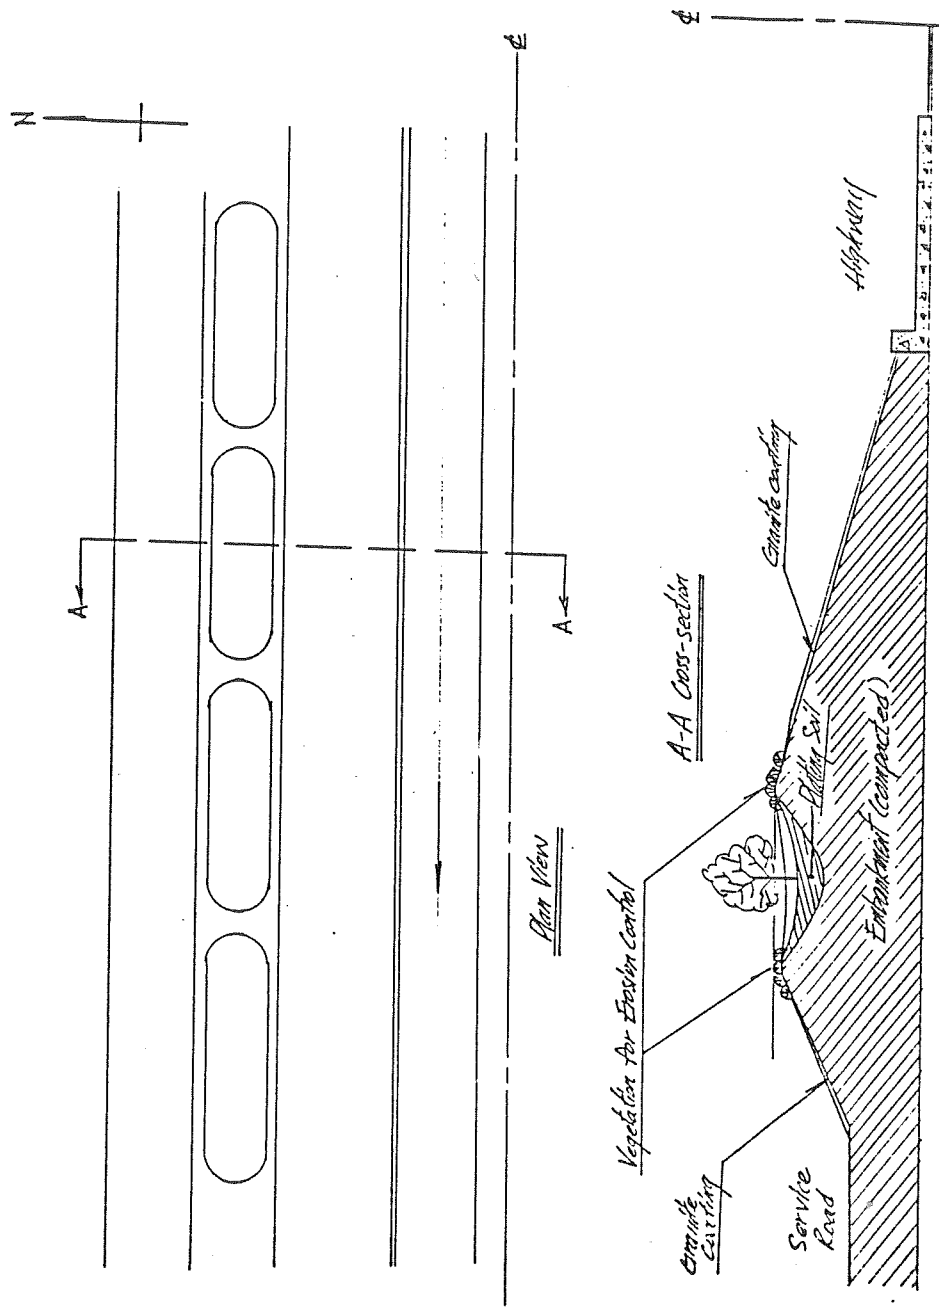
Suggested slope drainage and landscaping design for a wide right-of-way
